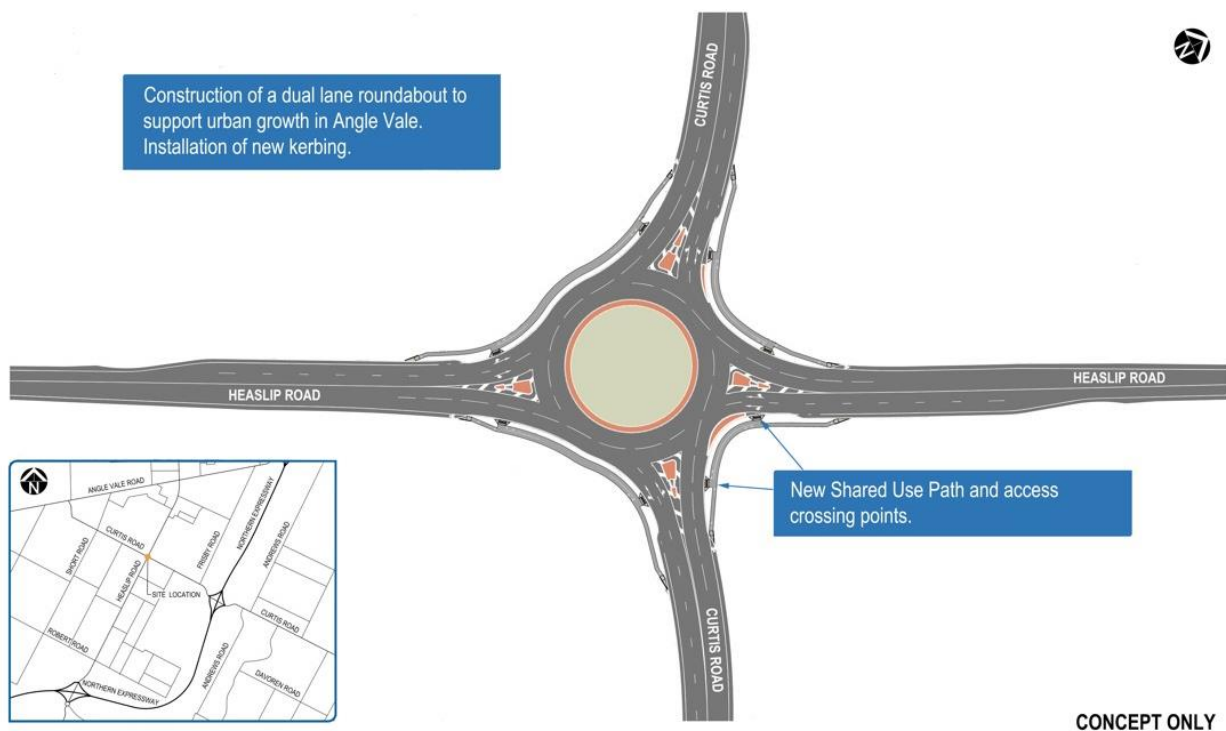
Concept plan for a dual lane roundabout at the intersection with Curtis Road and Heaslip Road, Angle Vale
